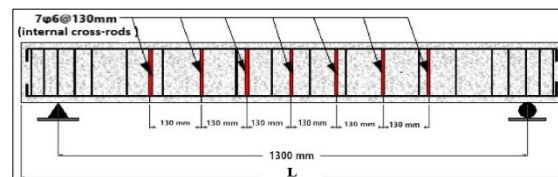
Beam Specifications and Reinforcement (B-7CR).
